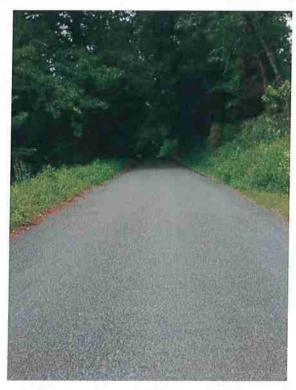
BMR PM 0.5, 20-ft. wide asphalt surface looking west, with a 10% longitudinal slope.
